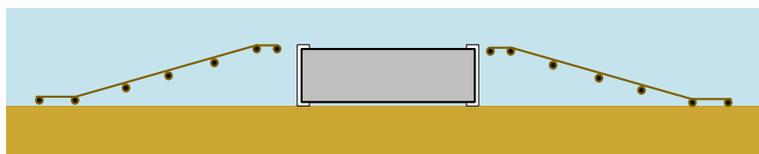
, TUNNEL ELEMENT PROTECTED; TOP VIEW
